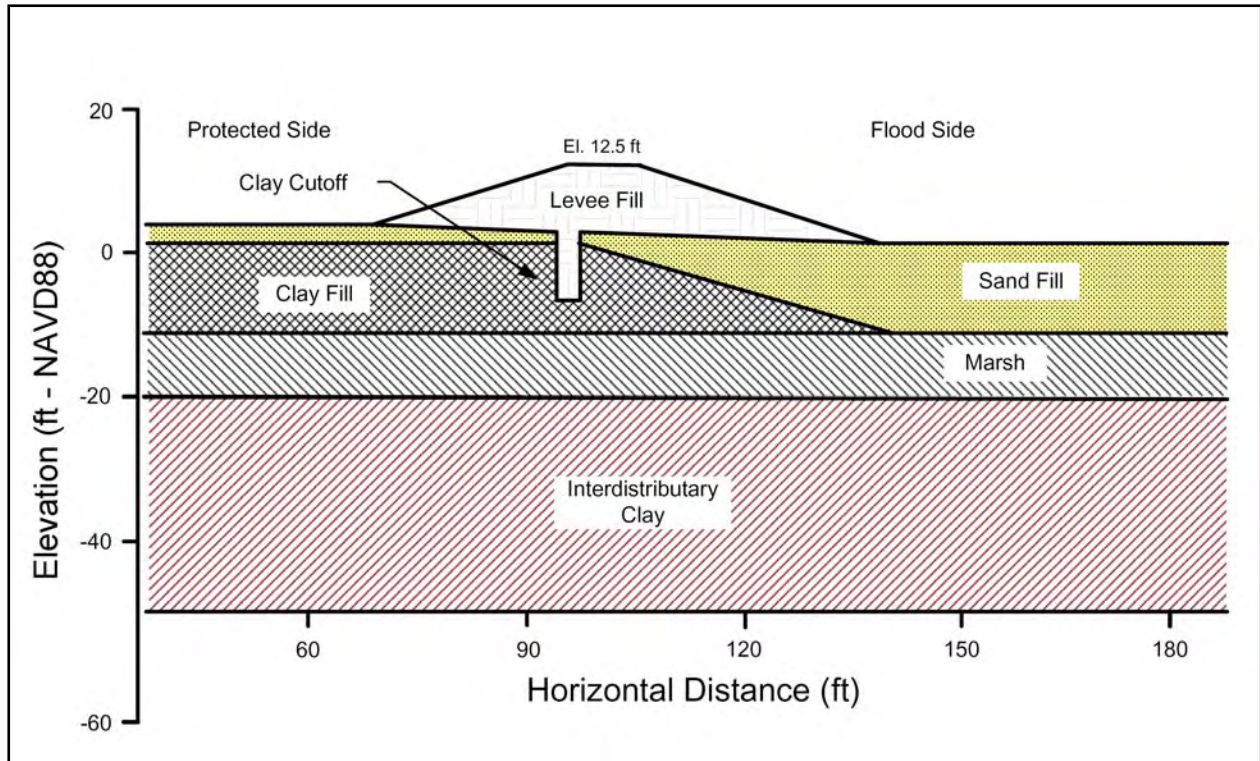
IHNC – West Bank – Cross Section of South Breach
